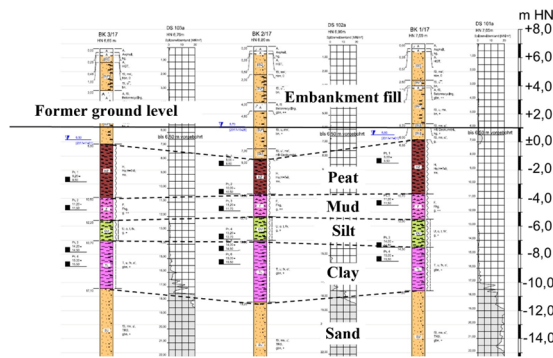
Longitudinal section of the subsoil in the damaged area, lane heading towards Szczecin (after Rackwitz et al. 2021).
